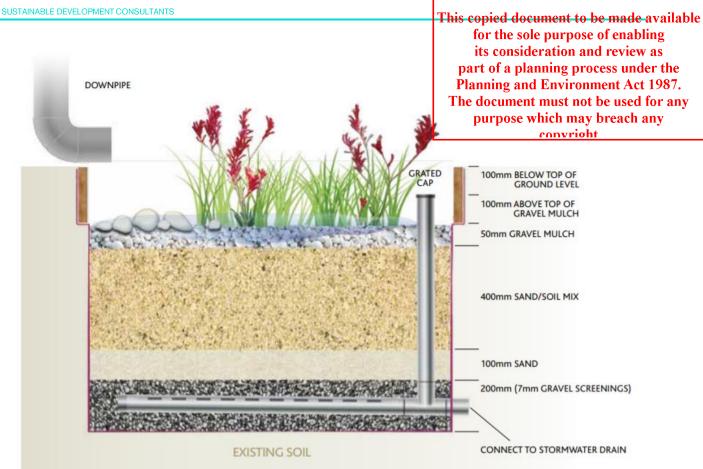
Example cross-sectional view of proposed inground raingarden (Source: Melbourne Water²)
